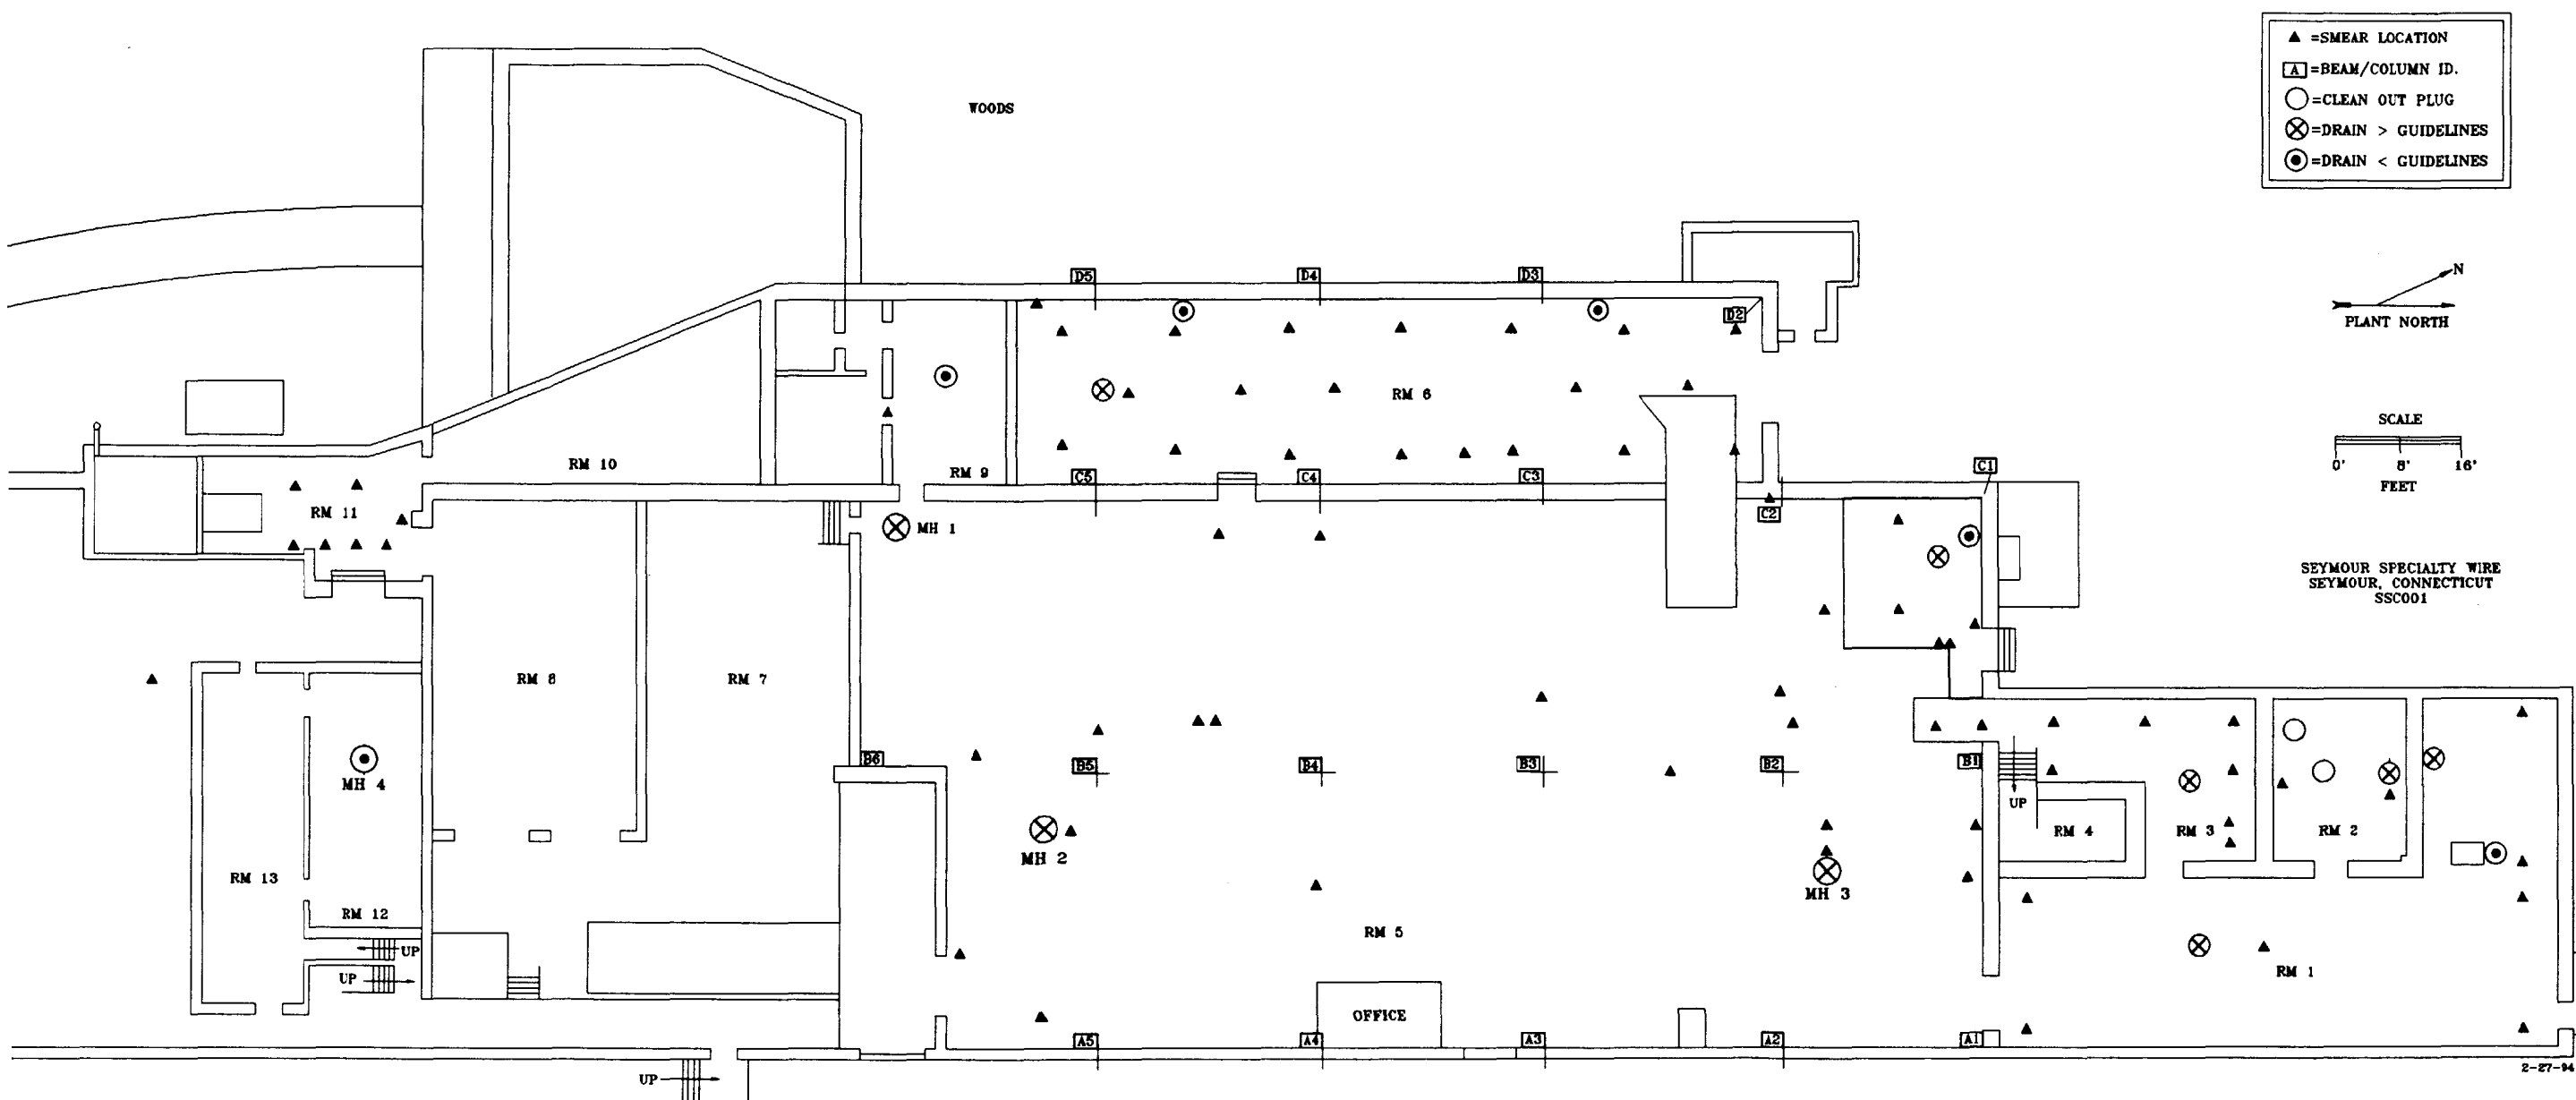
Locations of overhead smears on the first floor of the Ruffert Building.
